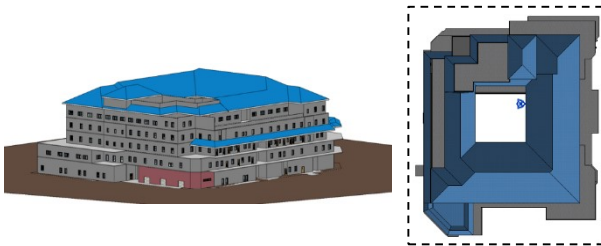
(b) 3-dimensional view and roof plan of the base model
